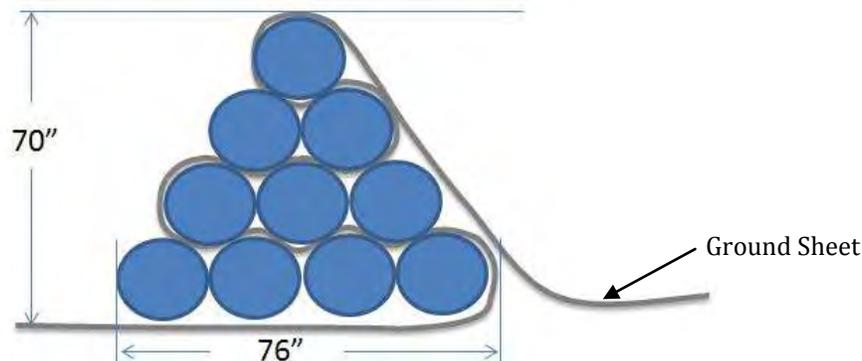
Water-Inflated Tubes Dimension Cross Section
